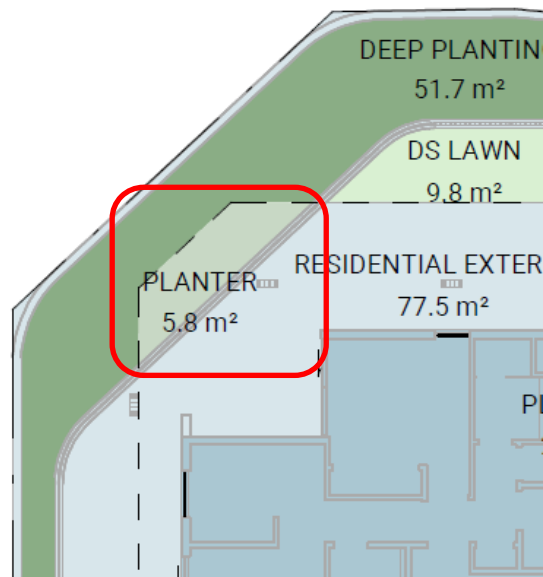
Basement protrusion beyond ground floor patio wall (Source: Drawing No. DA551 DA Plans by plus architecture June 2021)
